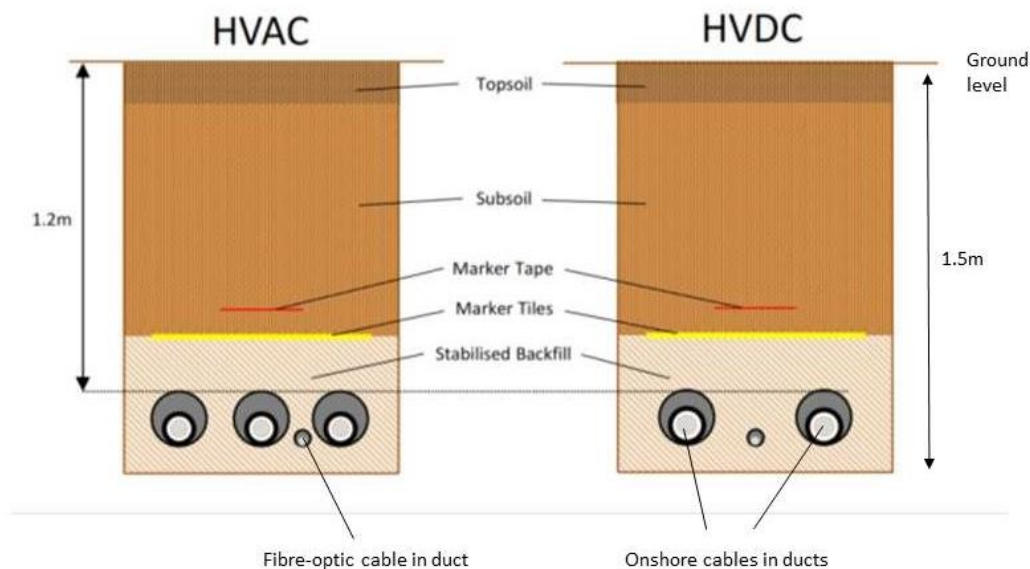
Indicative cable trench sections for HVAC (up to 6 trenches required) and HVDC (up to 2 trenches required) options
